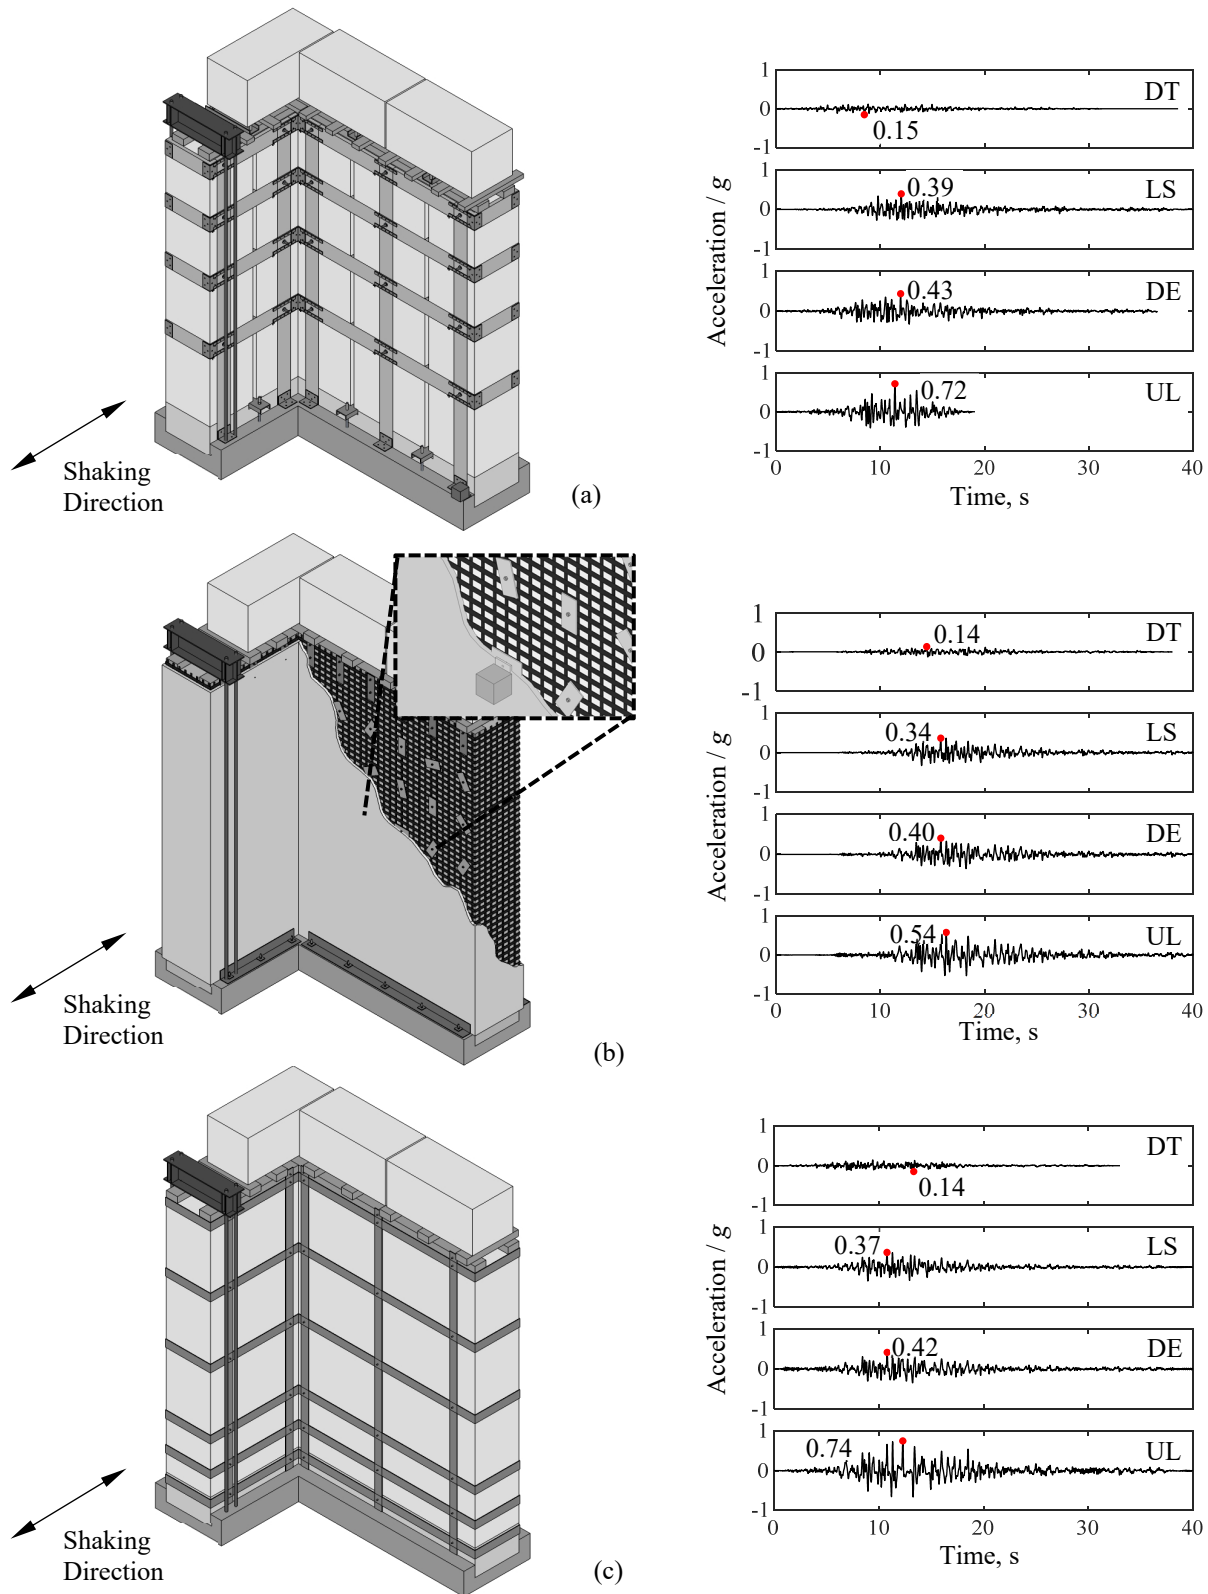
Configuration and input ground motions for shake table tests of corner walls: (a) retrofitting with timber planks and post-tensioning tensors; (b) retrofitting with meshes; (c) retrofitting with steel plates.
